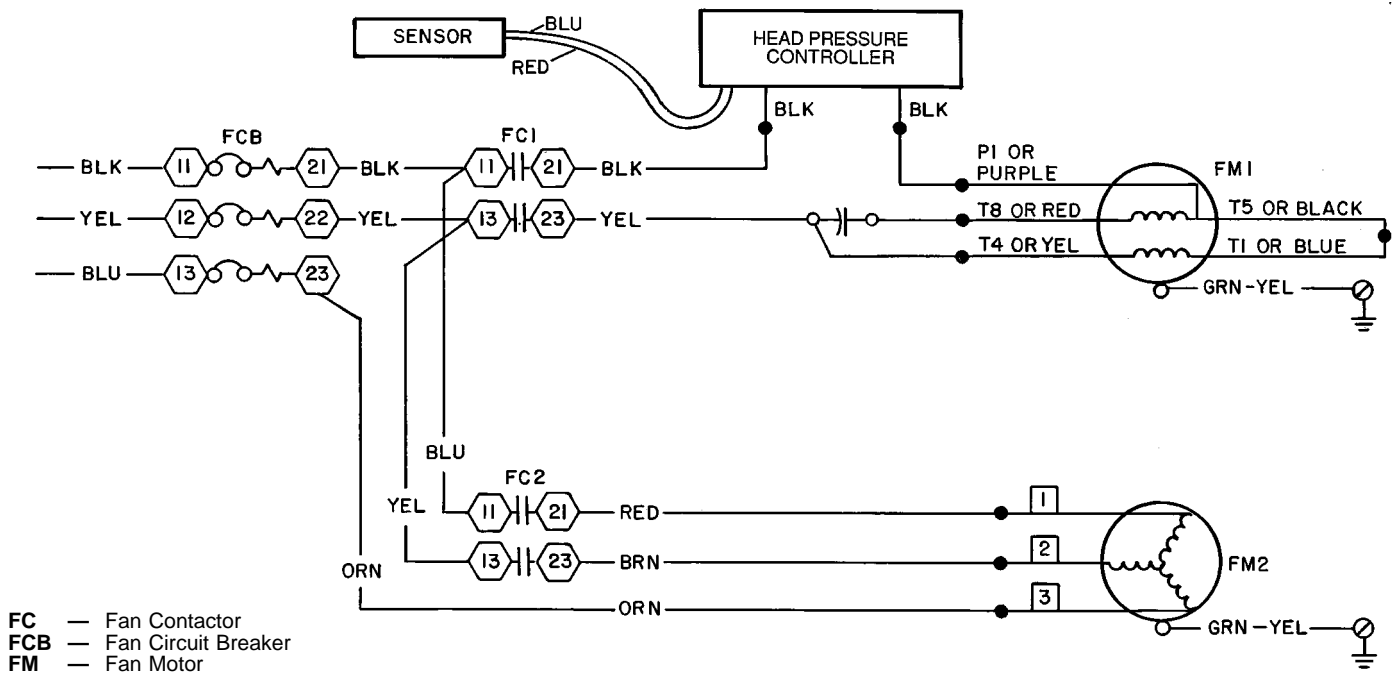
Head Pressure Controller Wiring, 208/230 V 576B Units
